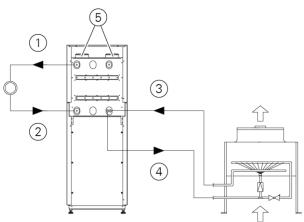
Hydraulic and electrical connections to the heat pump (schematic)
